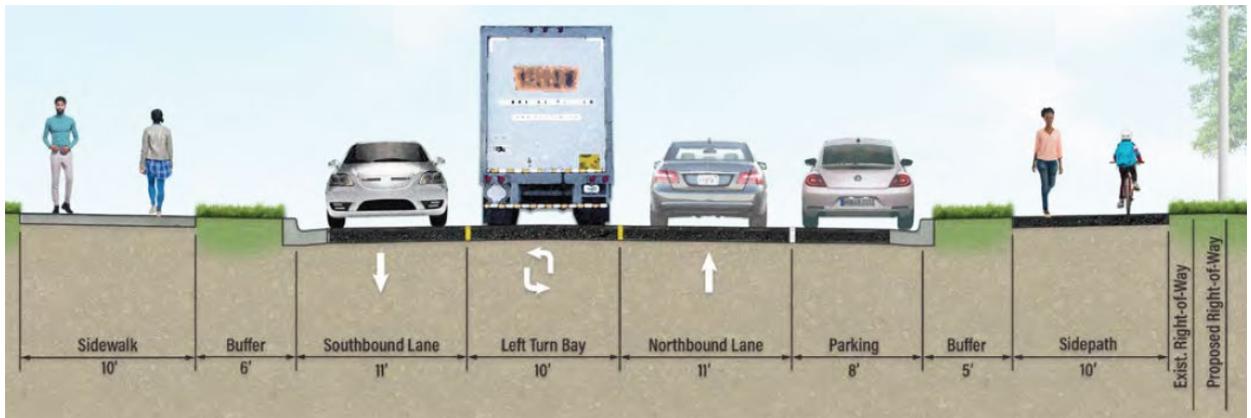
Alternative 3 - Prosperity Drive Typical Cross Section
